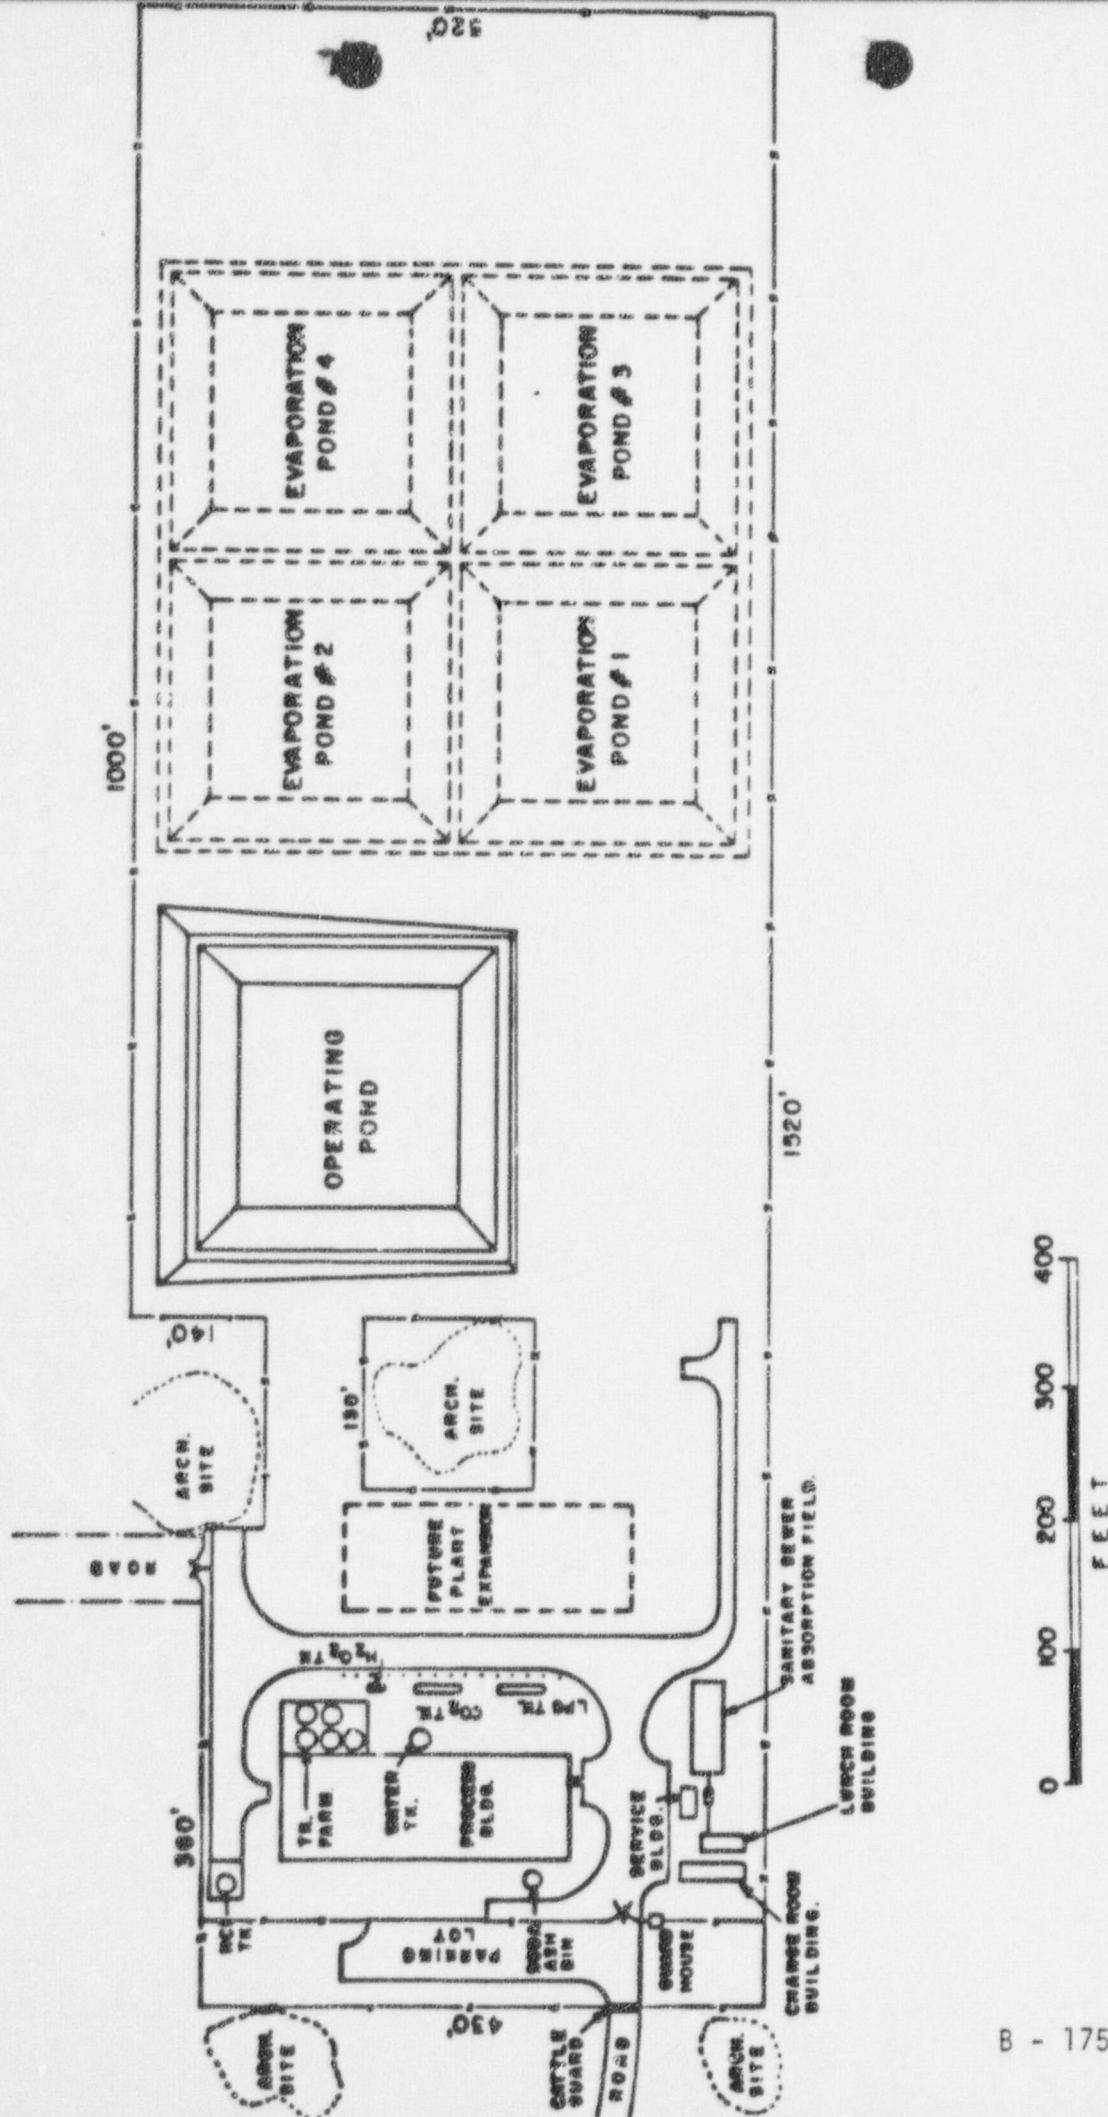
PLANT SITE, OPERATING POND, and EVAPORATION PONDS
